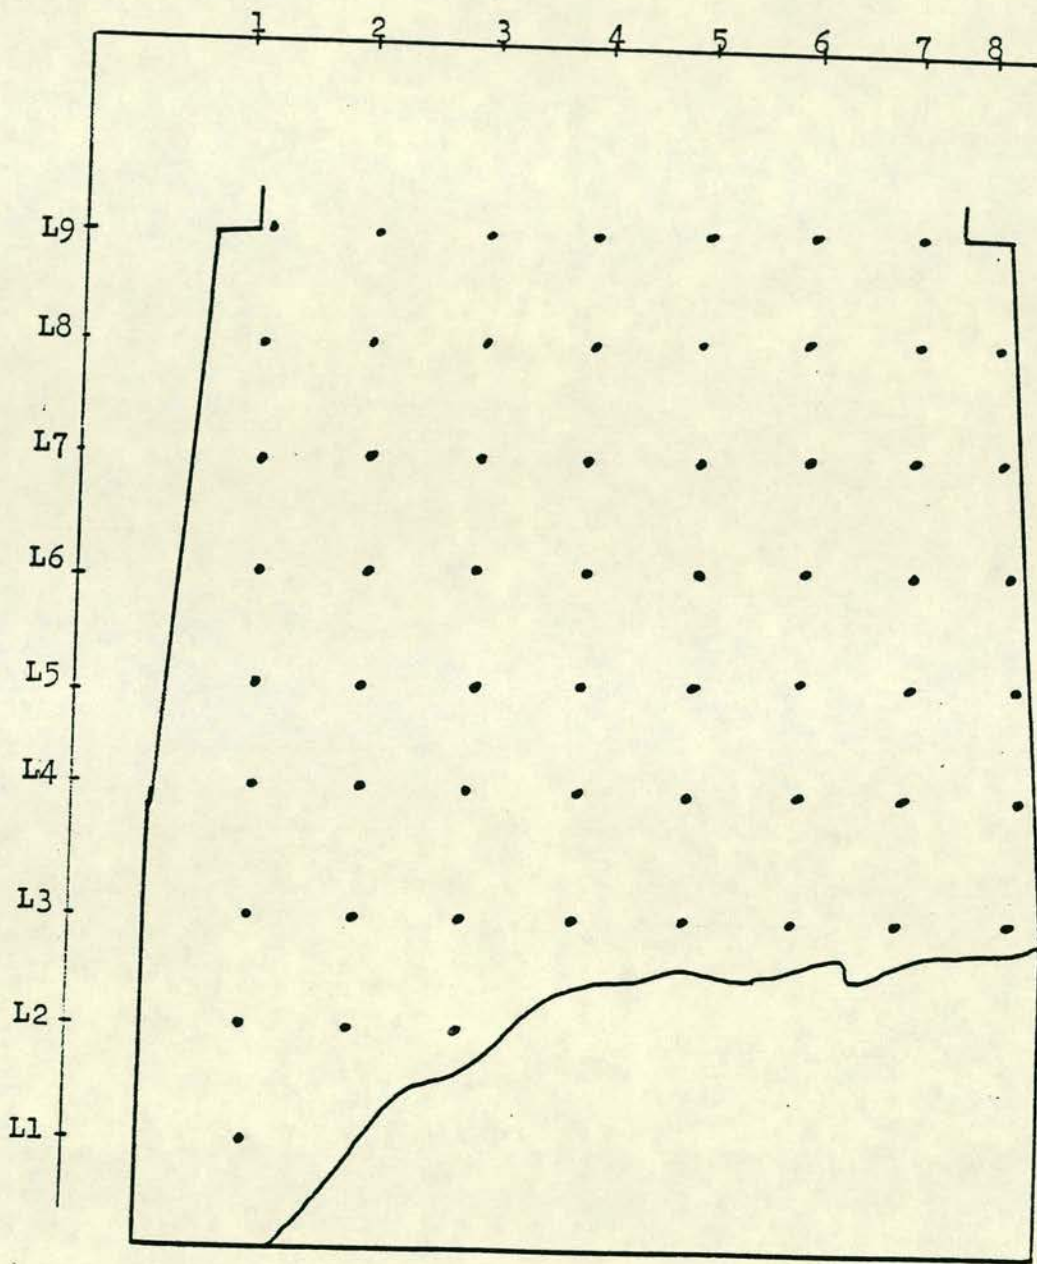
High Bridge - Struie - east abutment, location of reflection test points
